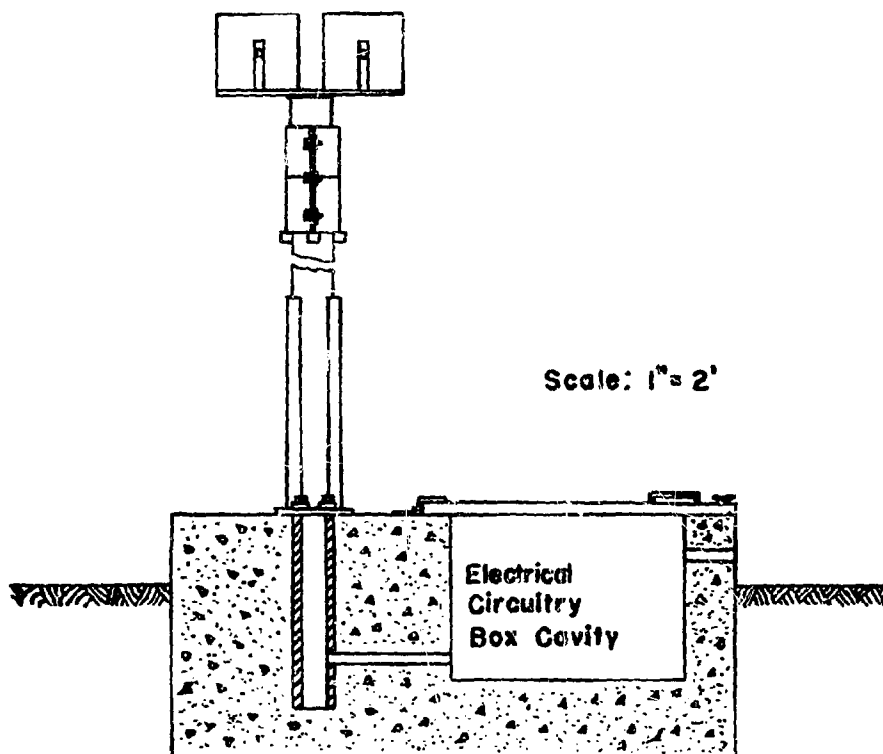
Sketch of an Unguyed 6 Ft Tower - Also shows the sunken reinforced concrete base housing the electrical circuitry equipments used to control the cameras. The design of the towers was standardized and different tower heights were obtained by varying the length of the steel pipe used to support the cameras and associated equipments. All towers over 6 ft high were guyed with three flexible steel wires emanating from a triangular ring welded just below the adjustable sleeve, and terminating in a "never-creep" anchor. The adjustable sleeves were tack welded to prevent rotation of the top plate after the cameras were sighted on the targets.
